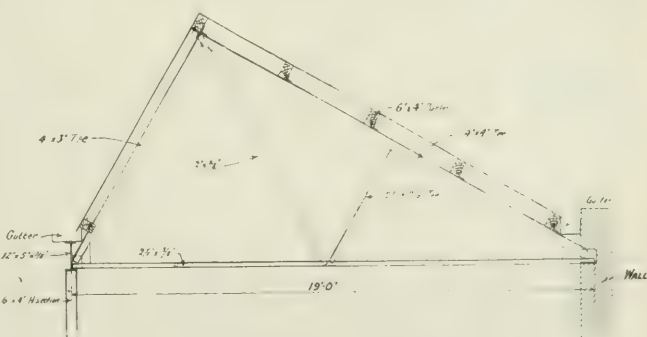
TRUSS ASSEMBLED BY ELECTRIC WELDING.
